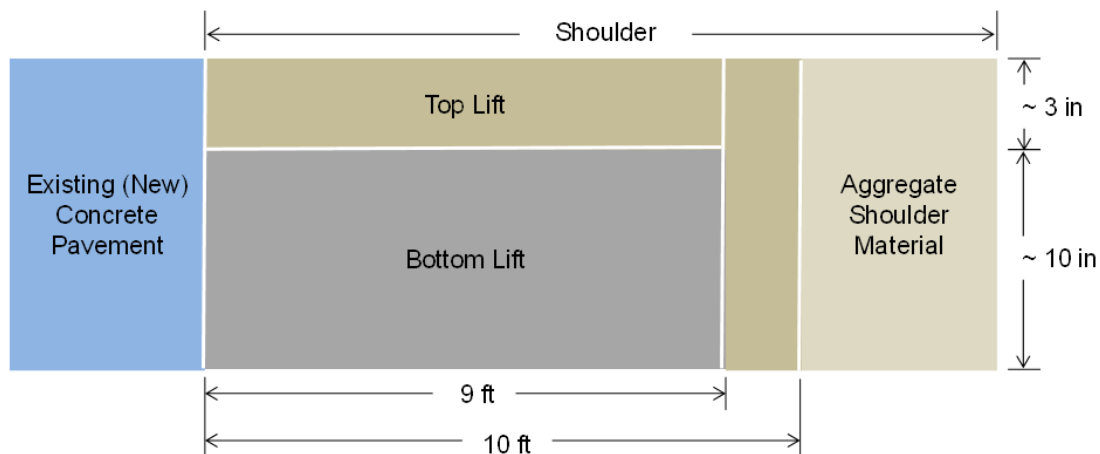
Schematic. Two-lift concrete composite shoulder pavement cross-section.
